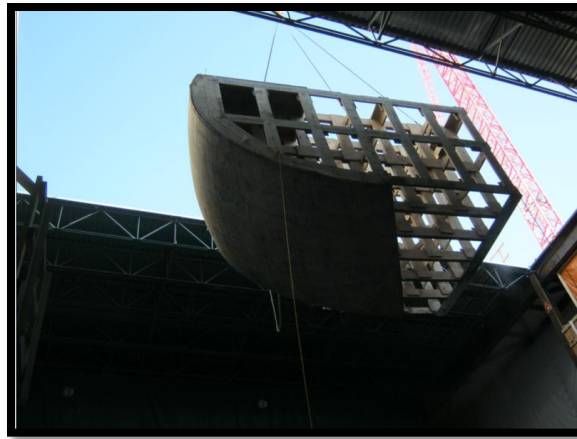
Tower crane transfer of formwork through shelter roof at Smoky Falls
